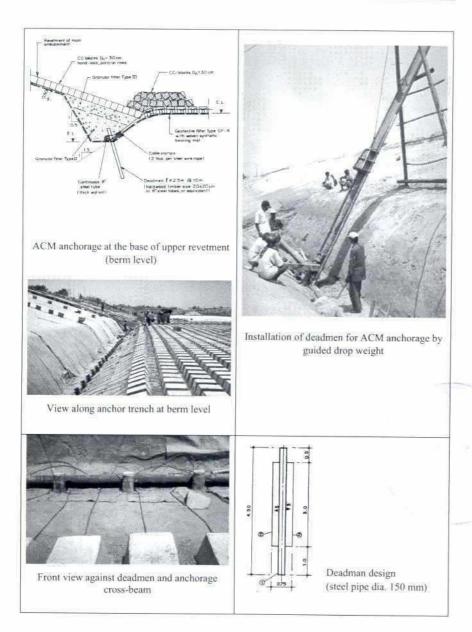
Anchoring of ACM (articulating concrete block mattress) for application as launching apron in a revetment structure
